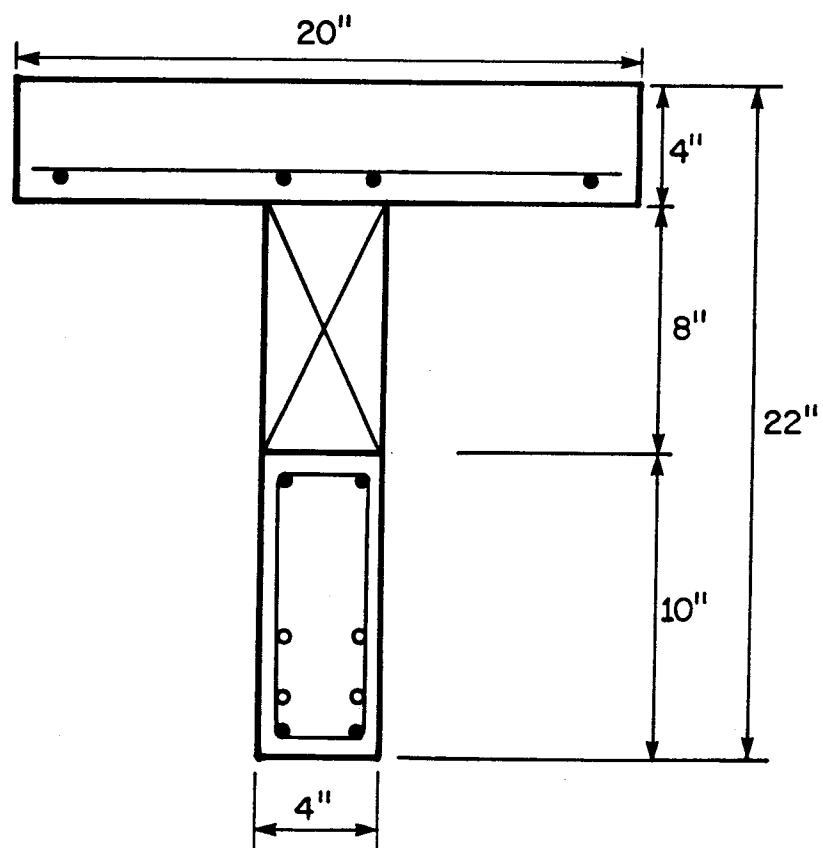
Typical Concrete Cross-Section - Series B and Series D.
